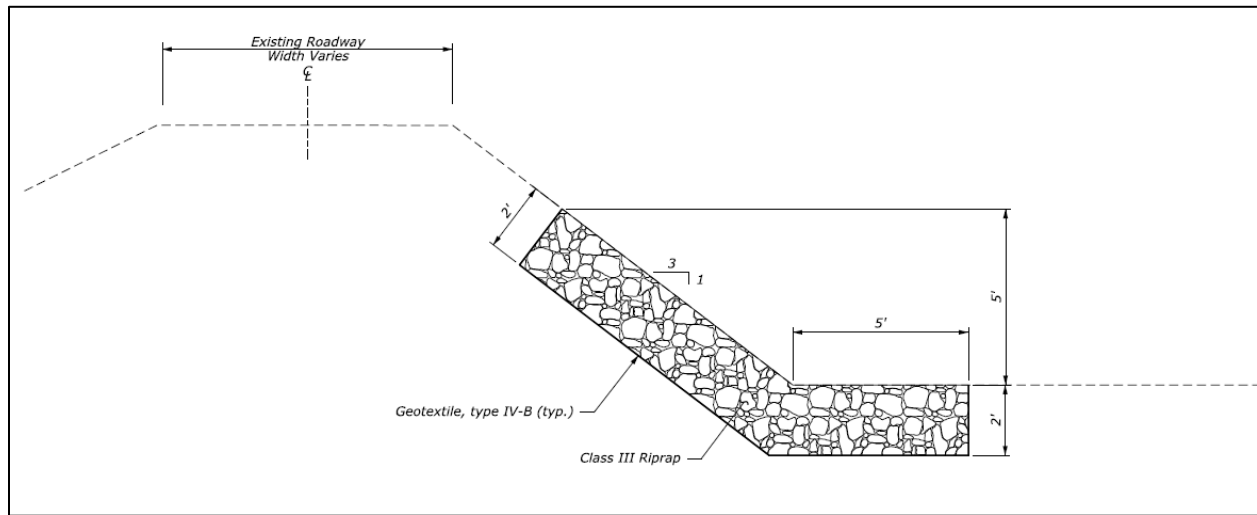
Typical Section of Planned Slope Armoring on Black Canyon Road
